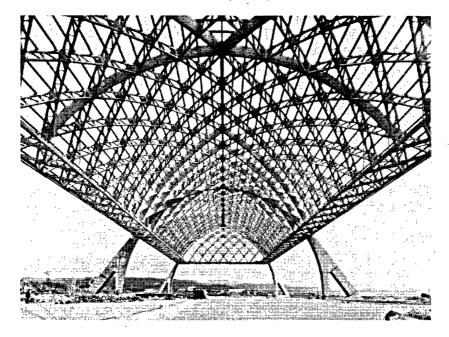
Precast concrete "lamella" roof construction at Orvieto, Nr Rome.
